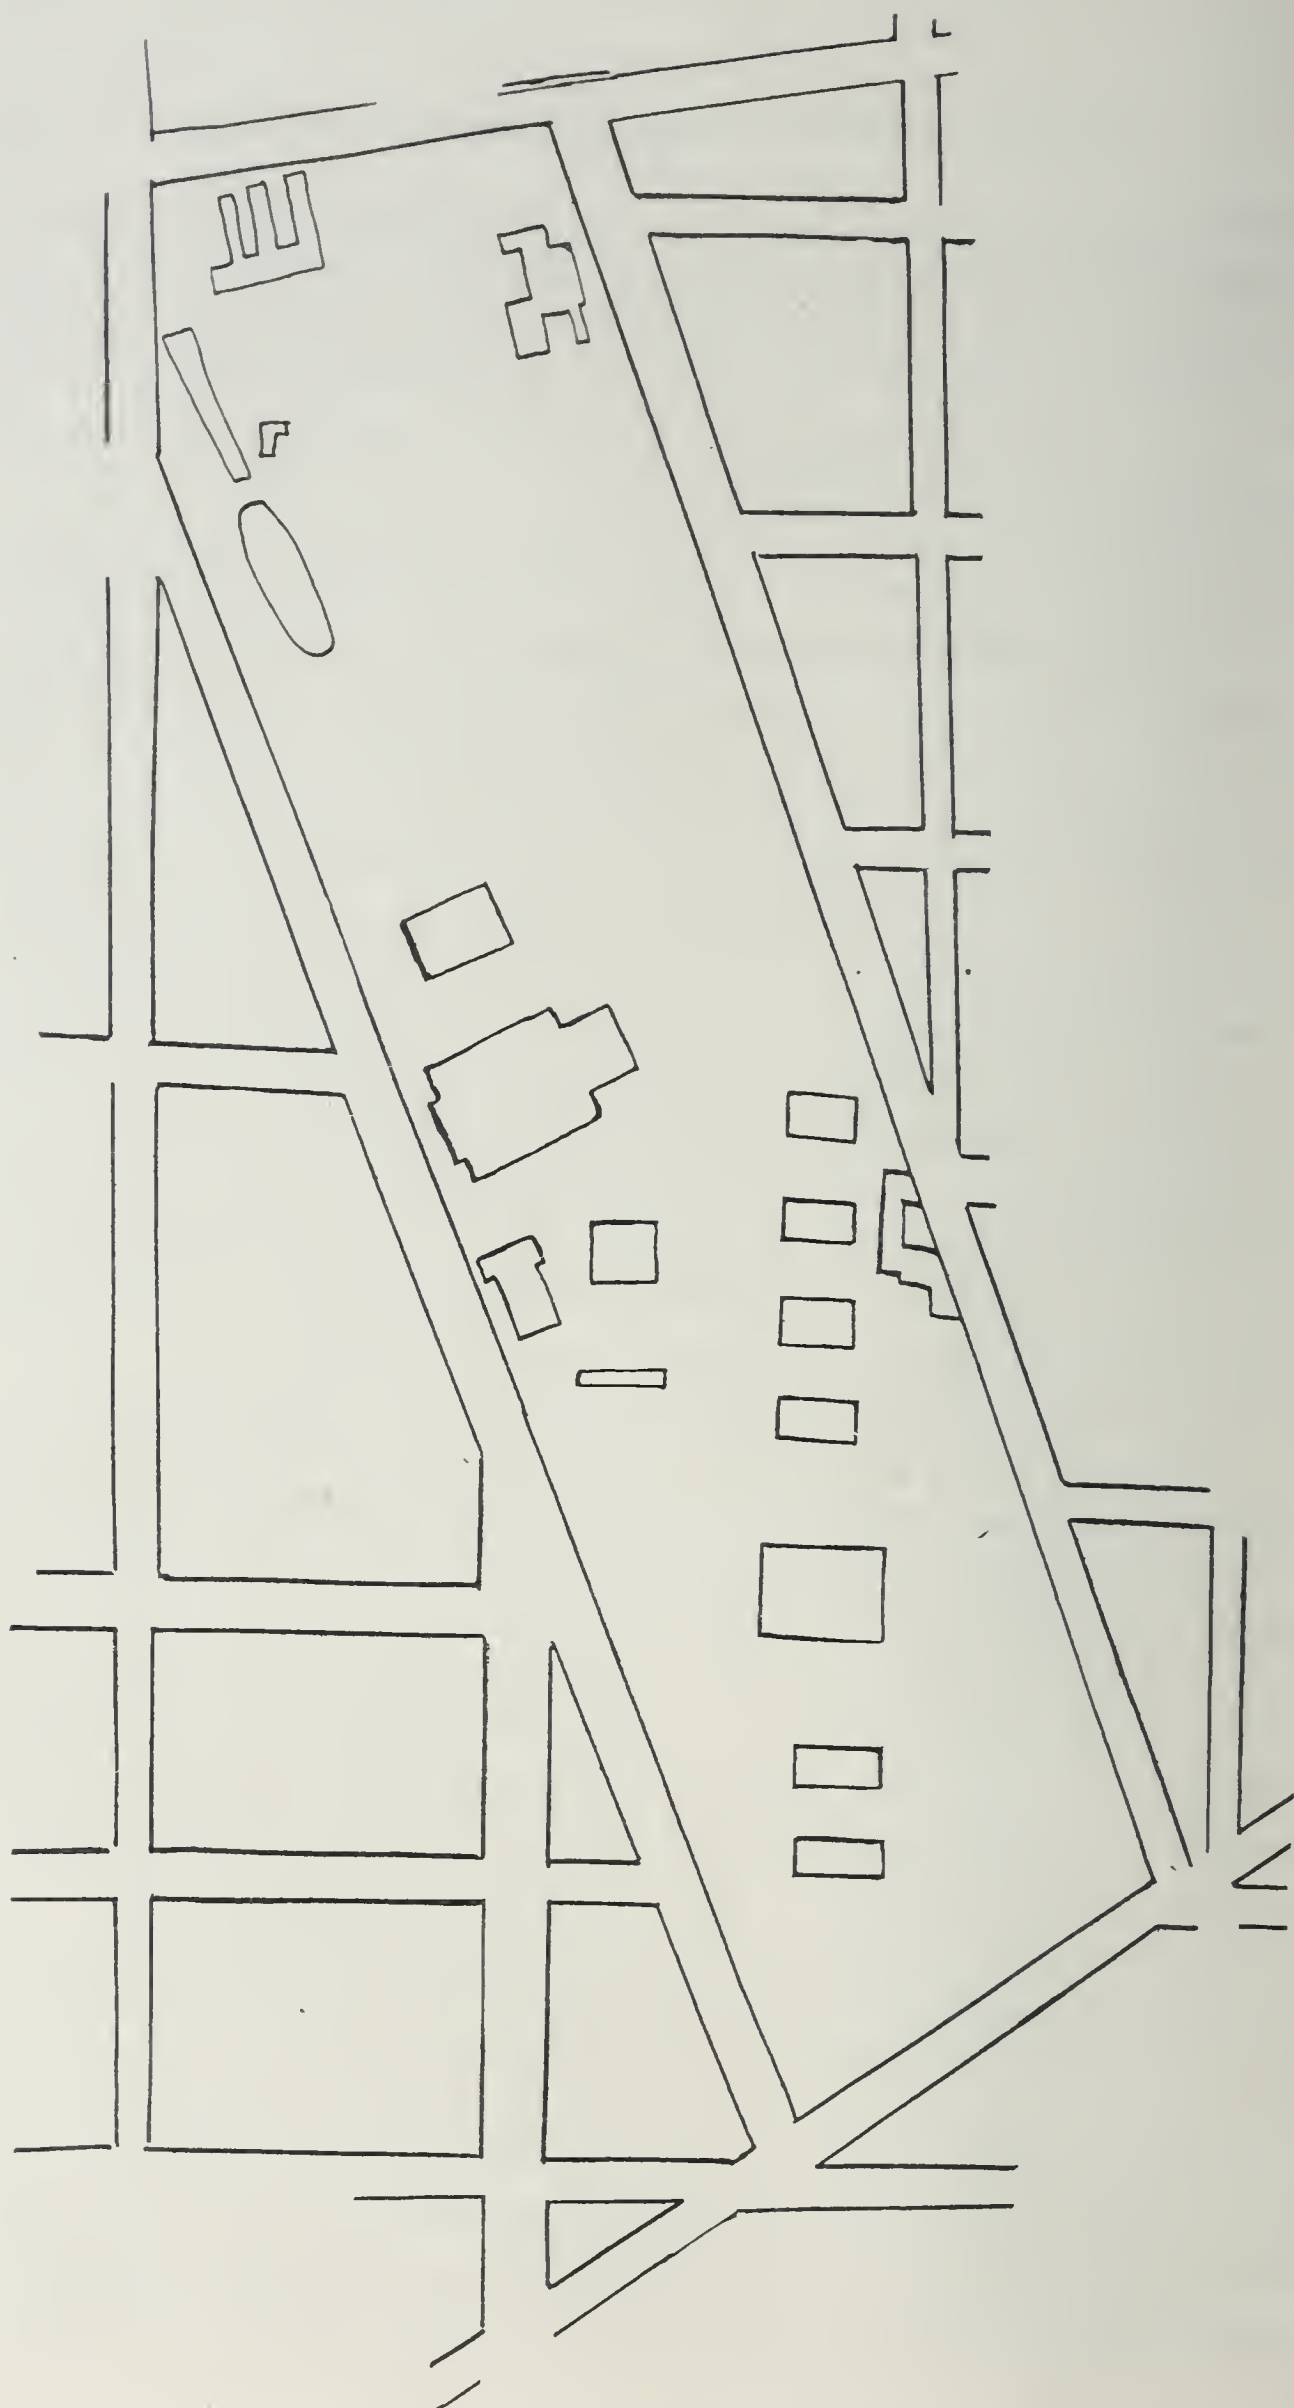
GENERAL PLAN OF GIRARD COLLEGE GROUNDS AND VICINITY.
